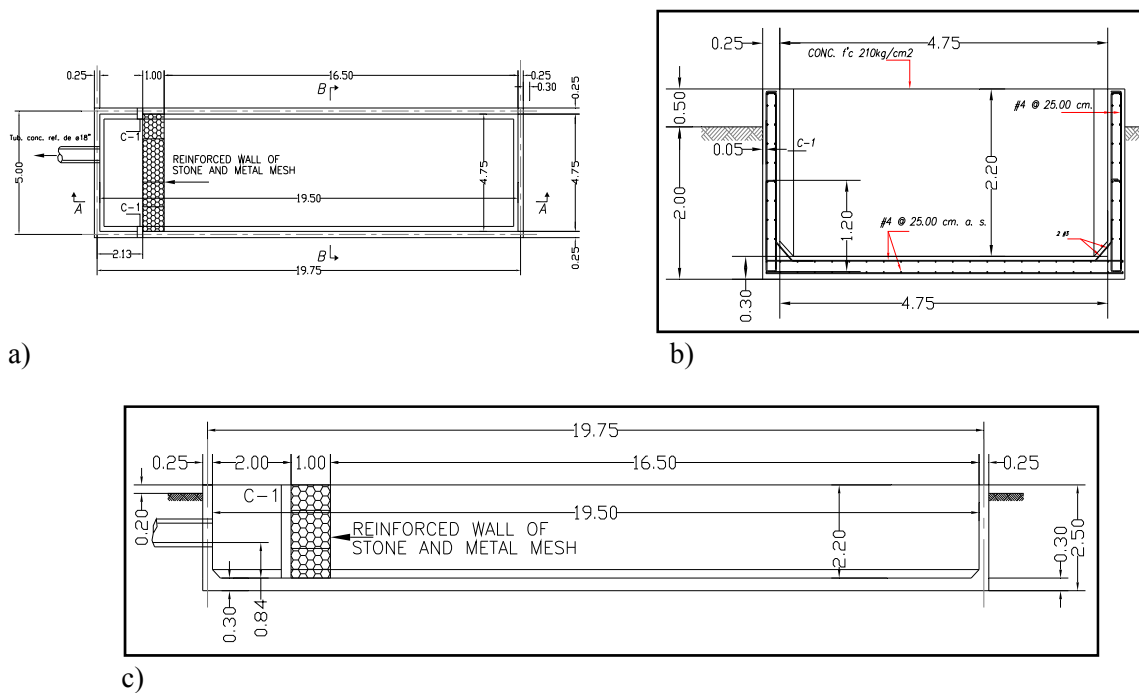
Design of the sludge tank, a) Planimetry of sludge tank, b) Section B-B in Figure 25a, and c) Section C-C in Figure 25a
